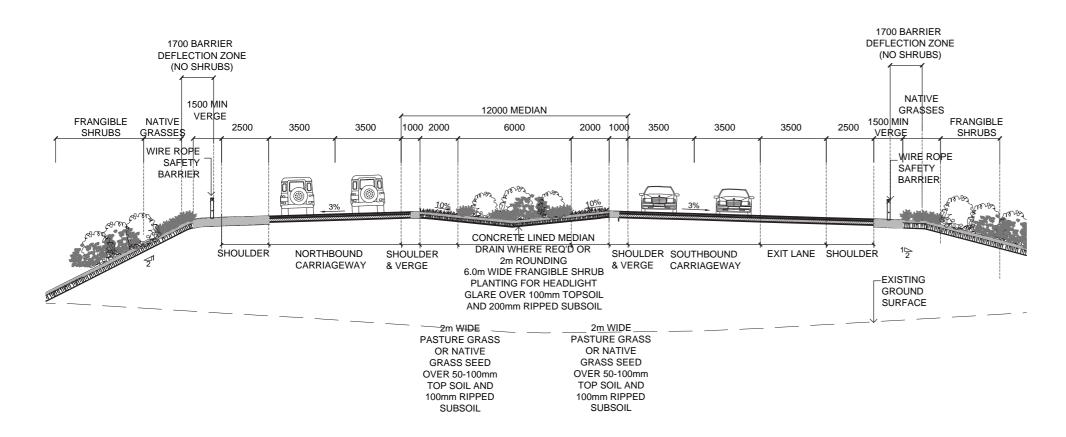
Typical Cross Section South of Heavy Vehicle Inspection Bay (Station 33400)
